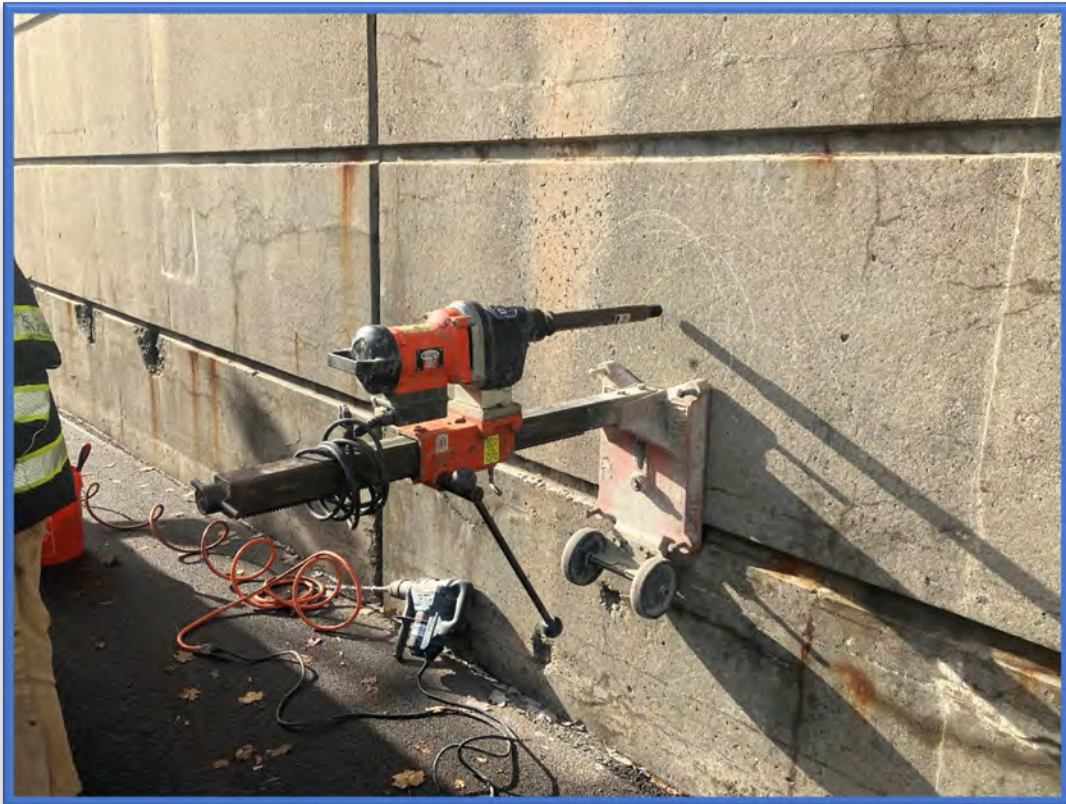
Coring tool attached to the retaining wall prior to coring.
